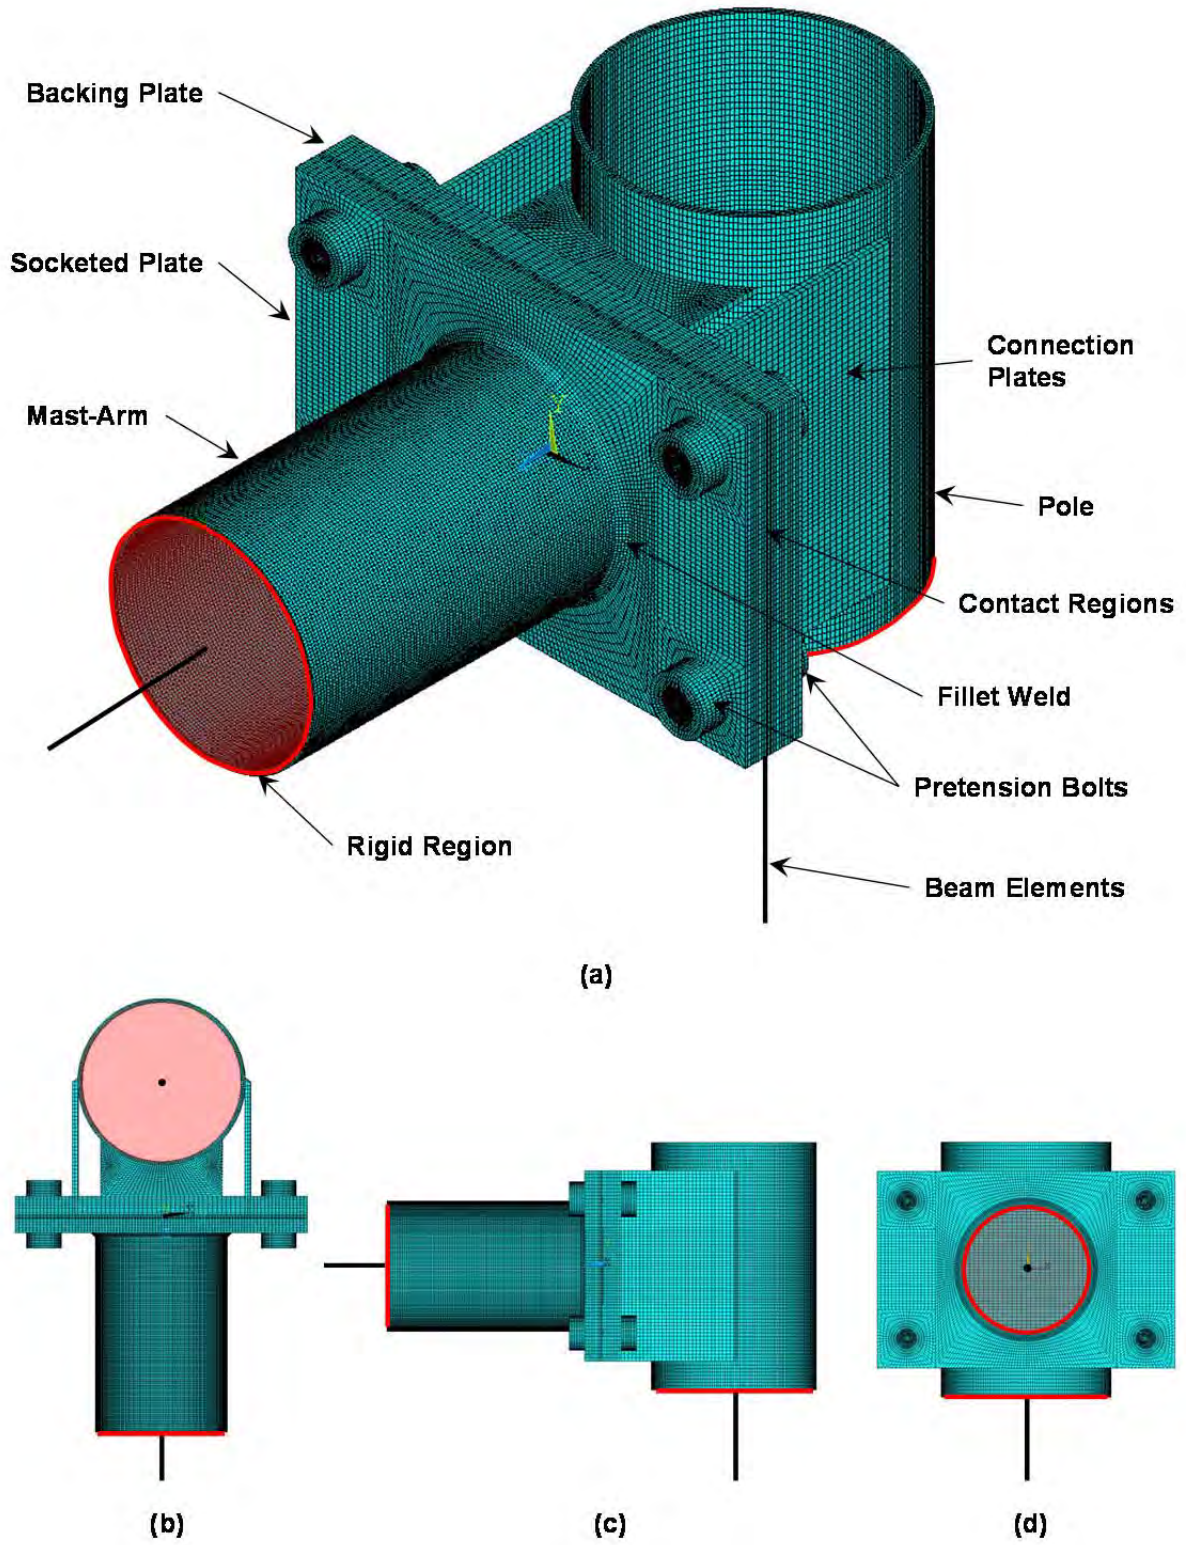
Osseo Sign Support Structure – detailed views of high-fidelity connection geometry and mesh: (a) labeled isometric view, (b) top view, (c) side view and (d) front view.
